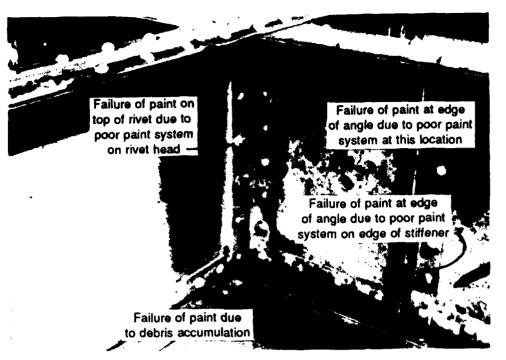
Vertical lift gate at Bankhead Lock and Dam with crevice corrosion, corrosion at edges, and corrosion on rivet heads
